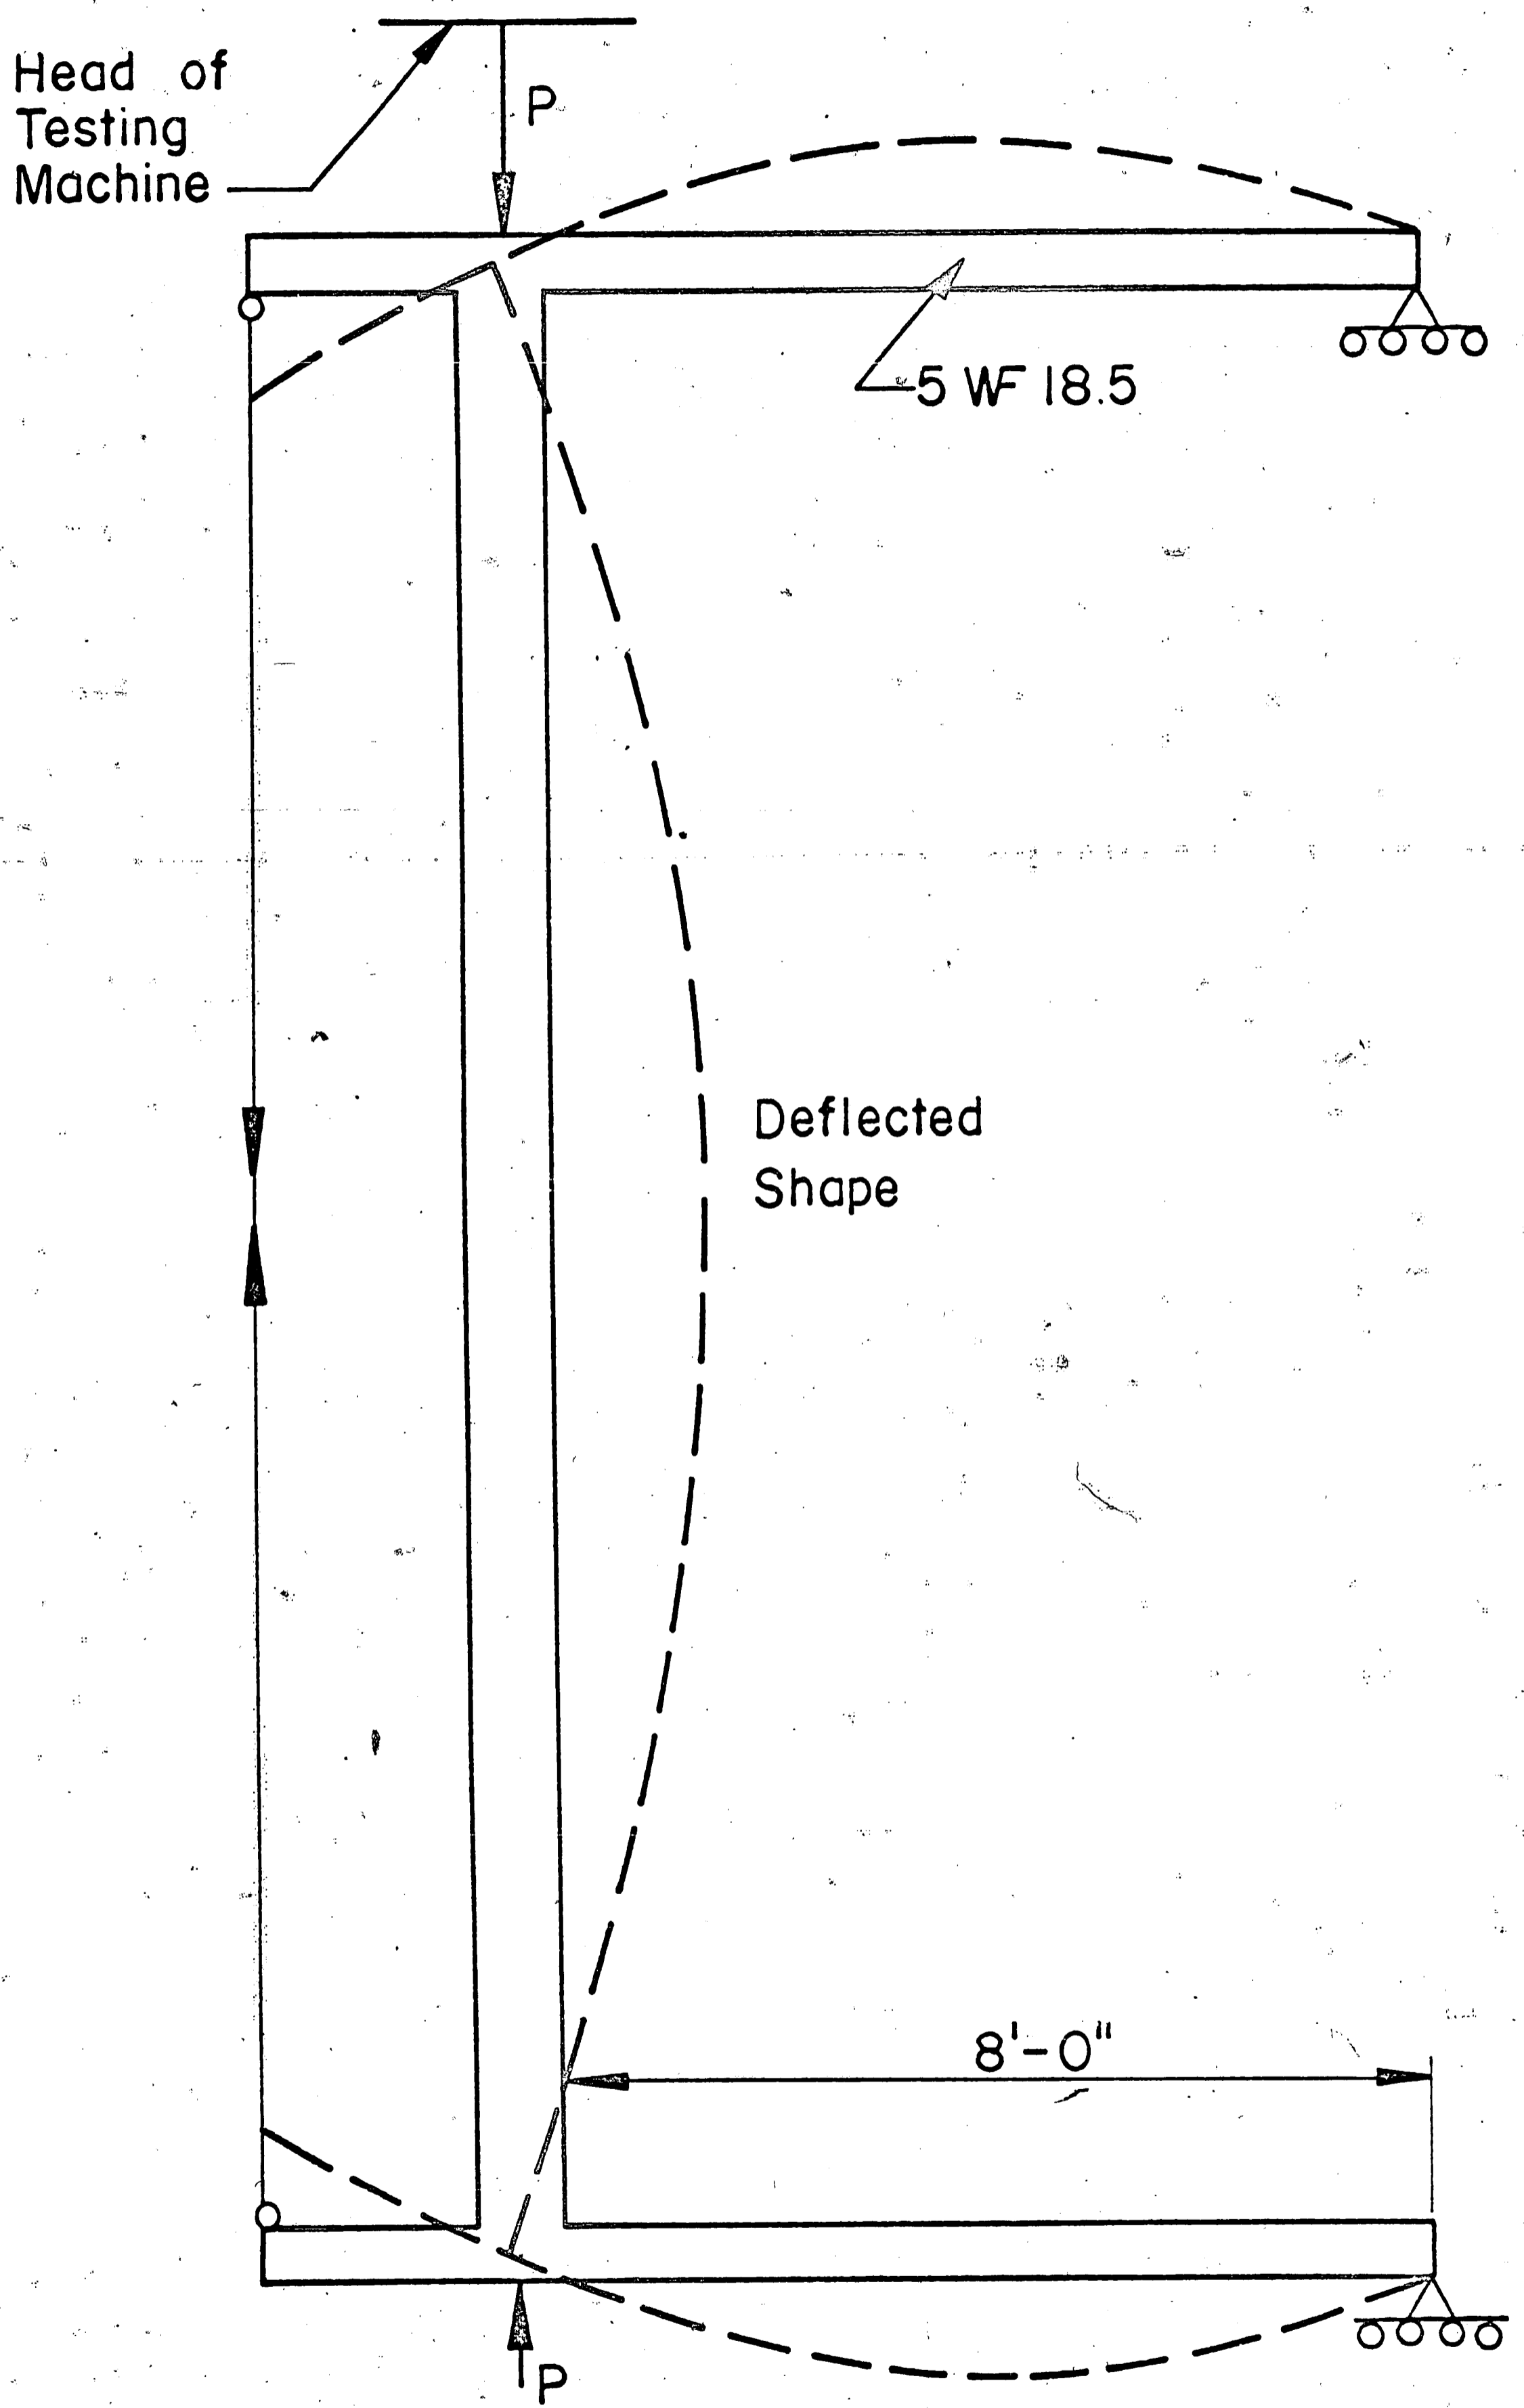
TEST SUBASSEMBLAGE (RC-3 and RC-10)
